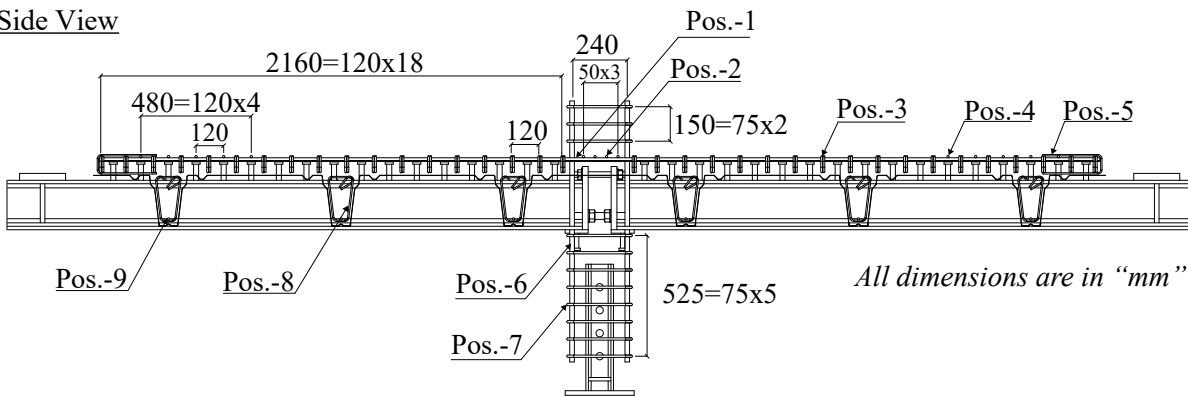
Technical details of the tested GJSFB joint configurations.
